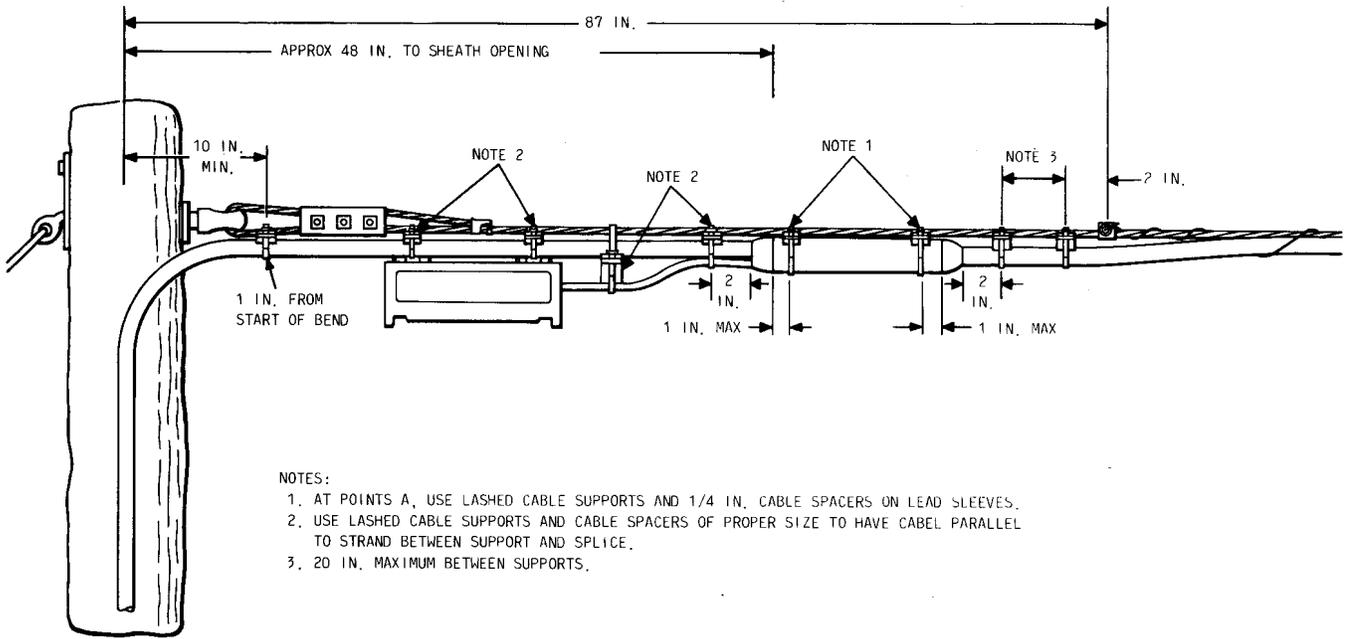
Strand Mounted N-Type Cable Terminal (Dead-End Pole)
